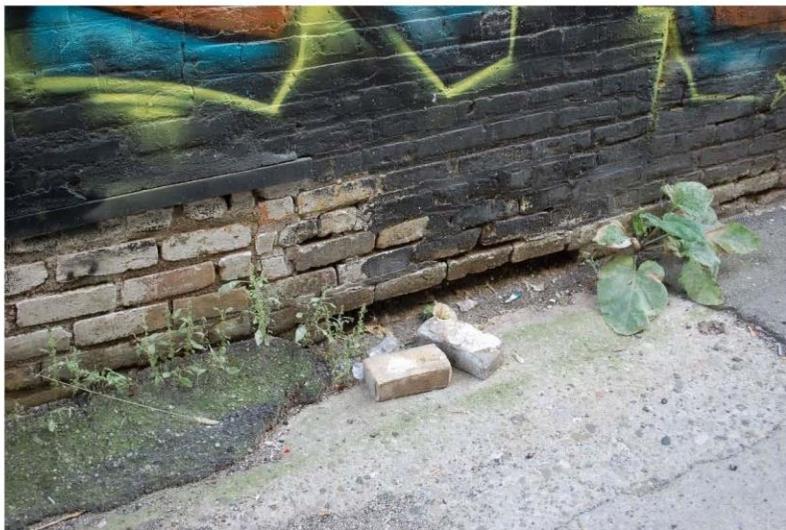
Brick deterioration at the base of pier on the north elevation. Loss of mortar.
